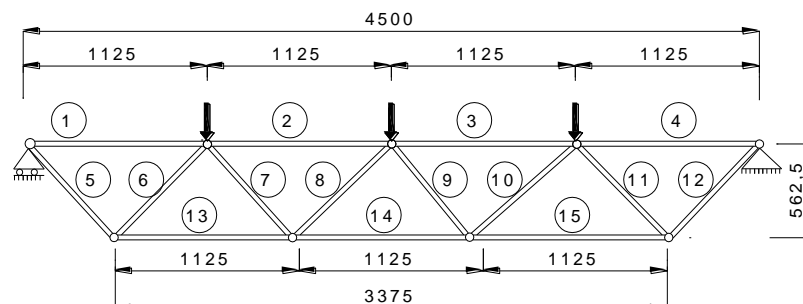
Fire test girders of Edwards (2004) (dimensions in mm)
